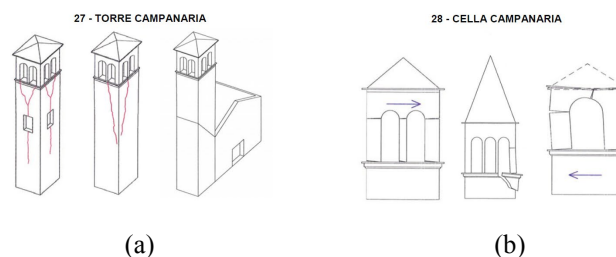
Bell tower mechanisms: (a) Mechanism 27, (b) Mechanism 28.
